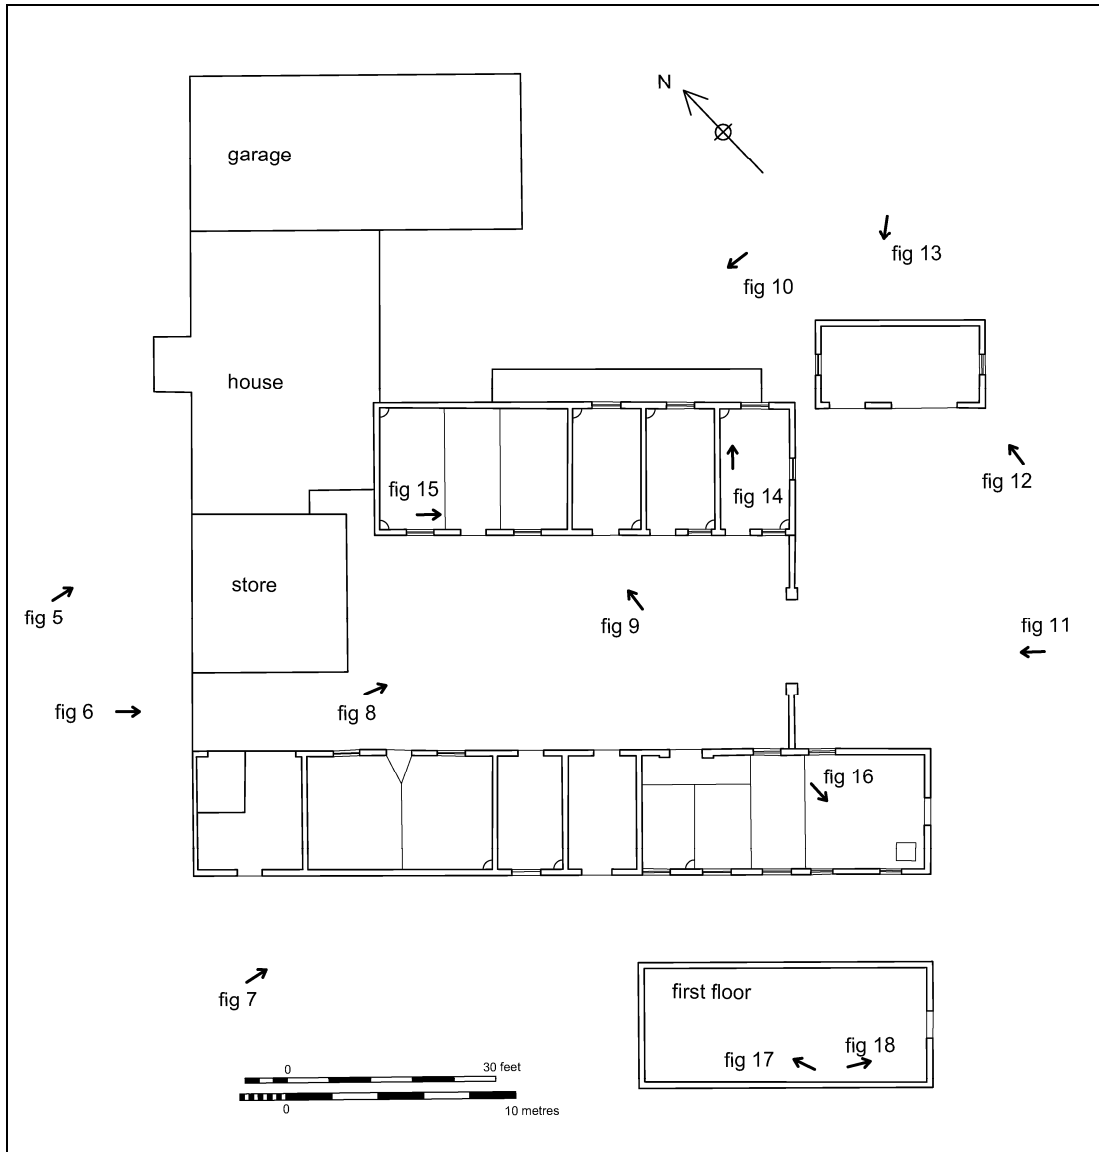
Floor plans of stable block, derived from plans supplied by Staniforth Architects Ltd.
